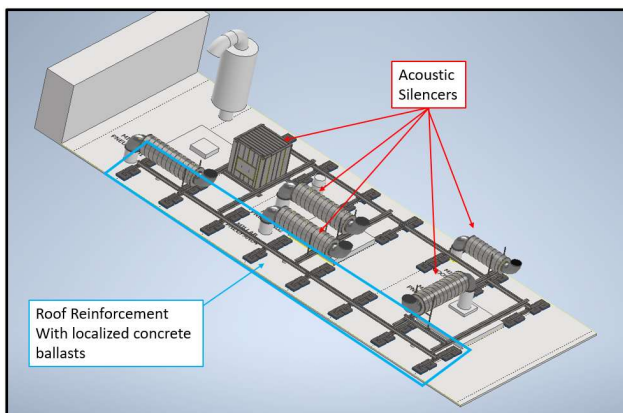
CAD model detailing extent of structural reinforcement with acoustical mitigation for facility-wide mitigation project.
